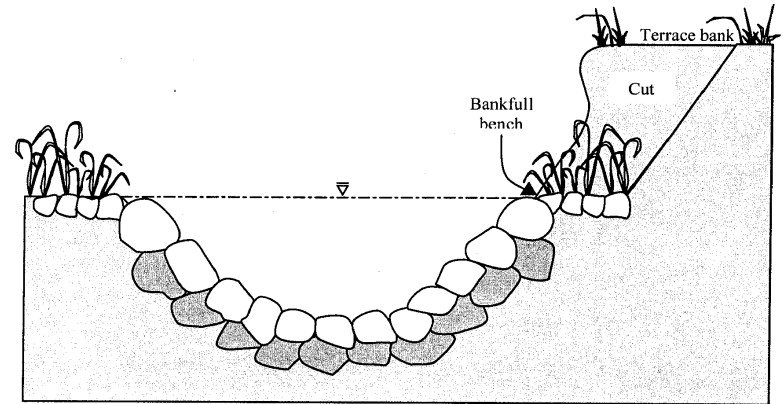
Example of a boulder Cross-Vane and constructed bankfull bench
